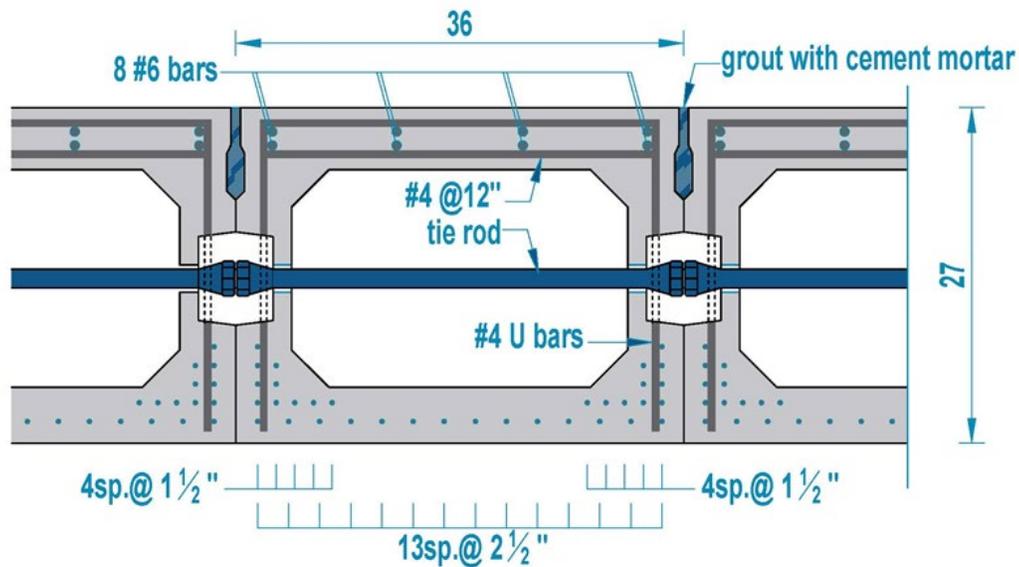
Cross-section of typical girder - Foulk Road bridge.
